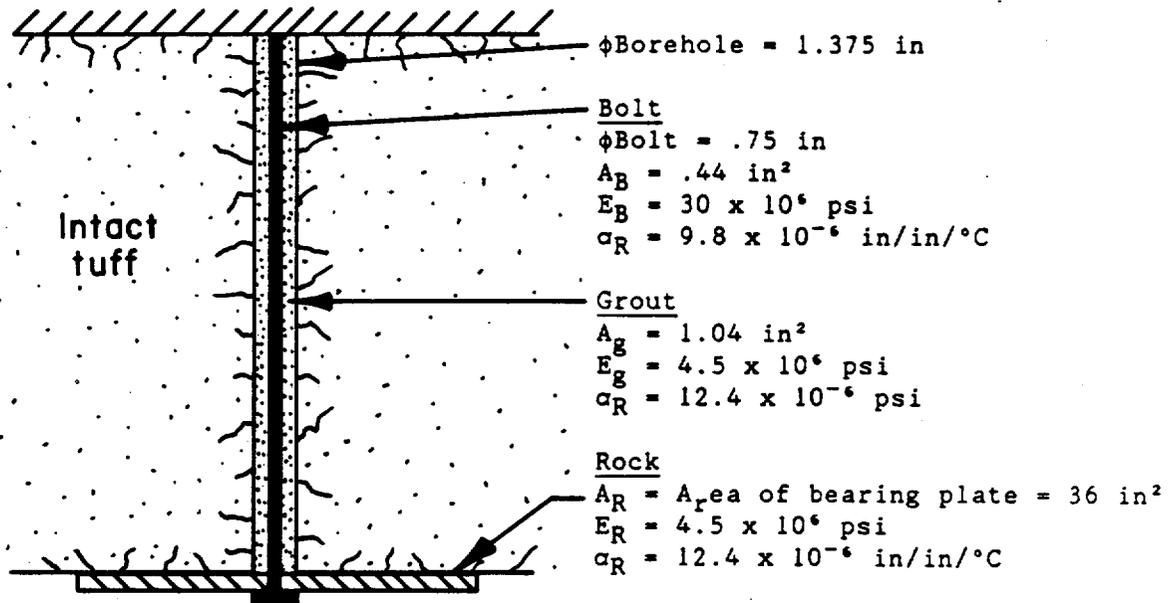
Differential Thermal Expansion of a Full Column Grouted Bolt
